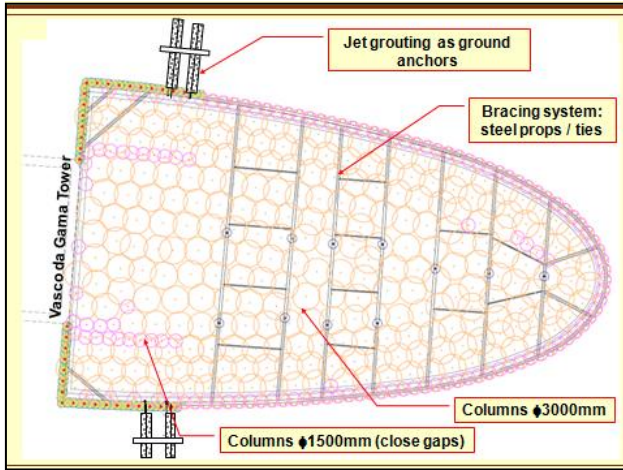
Plan of jet grouting solutions and cofferdam bracing systems.
